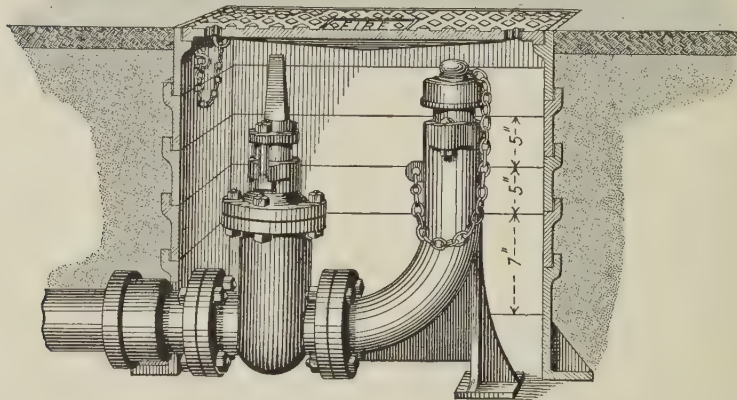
Pit or Sunk Hydrant with Single Outlet, Sluice Valve, and Cast-iron Extension Surface Box
